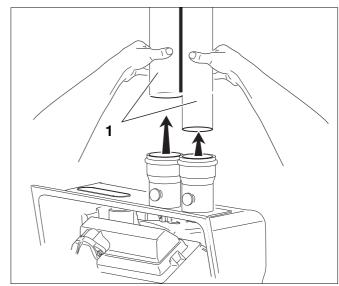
Loosening the combustion air supply and flue gas exhaust connections
